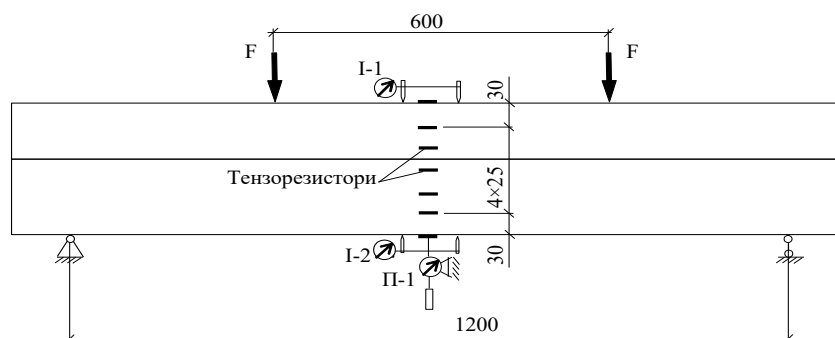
Scheme of loading during experimental testing of concrete beams and placement of measuring instruments
